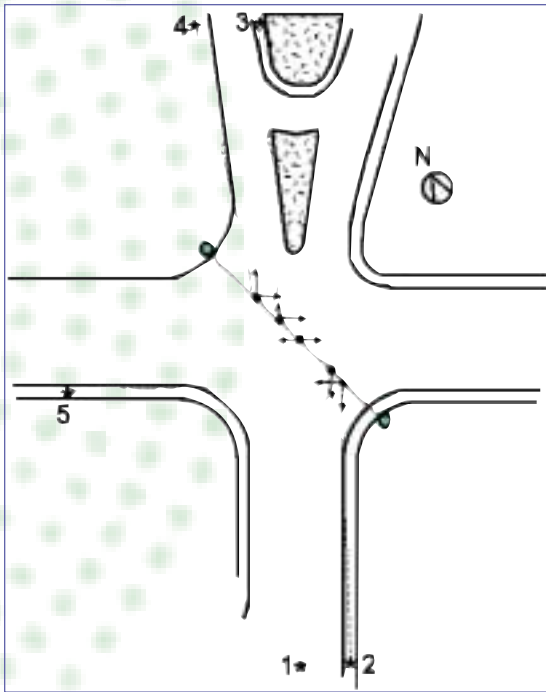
Sketch of Troy intersection layout, showing measurement locations.
